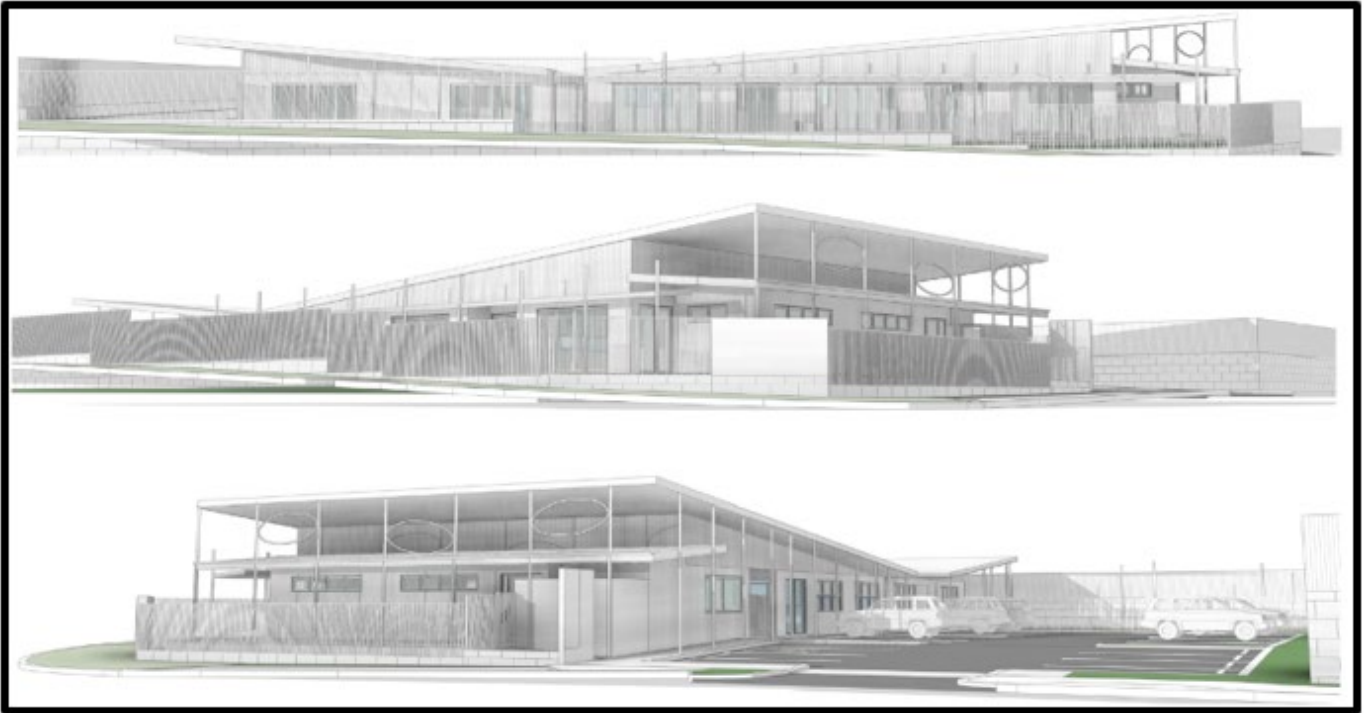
Elevation from Beenyup Road (top), north-west corner of the site (middle) and from Dundatha Drive (west)
